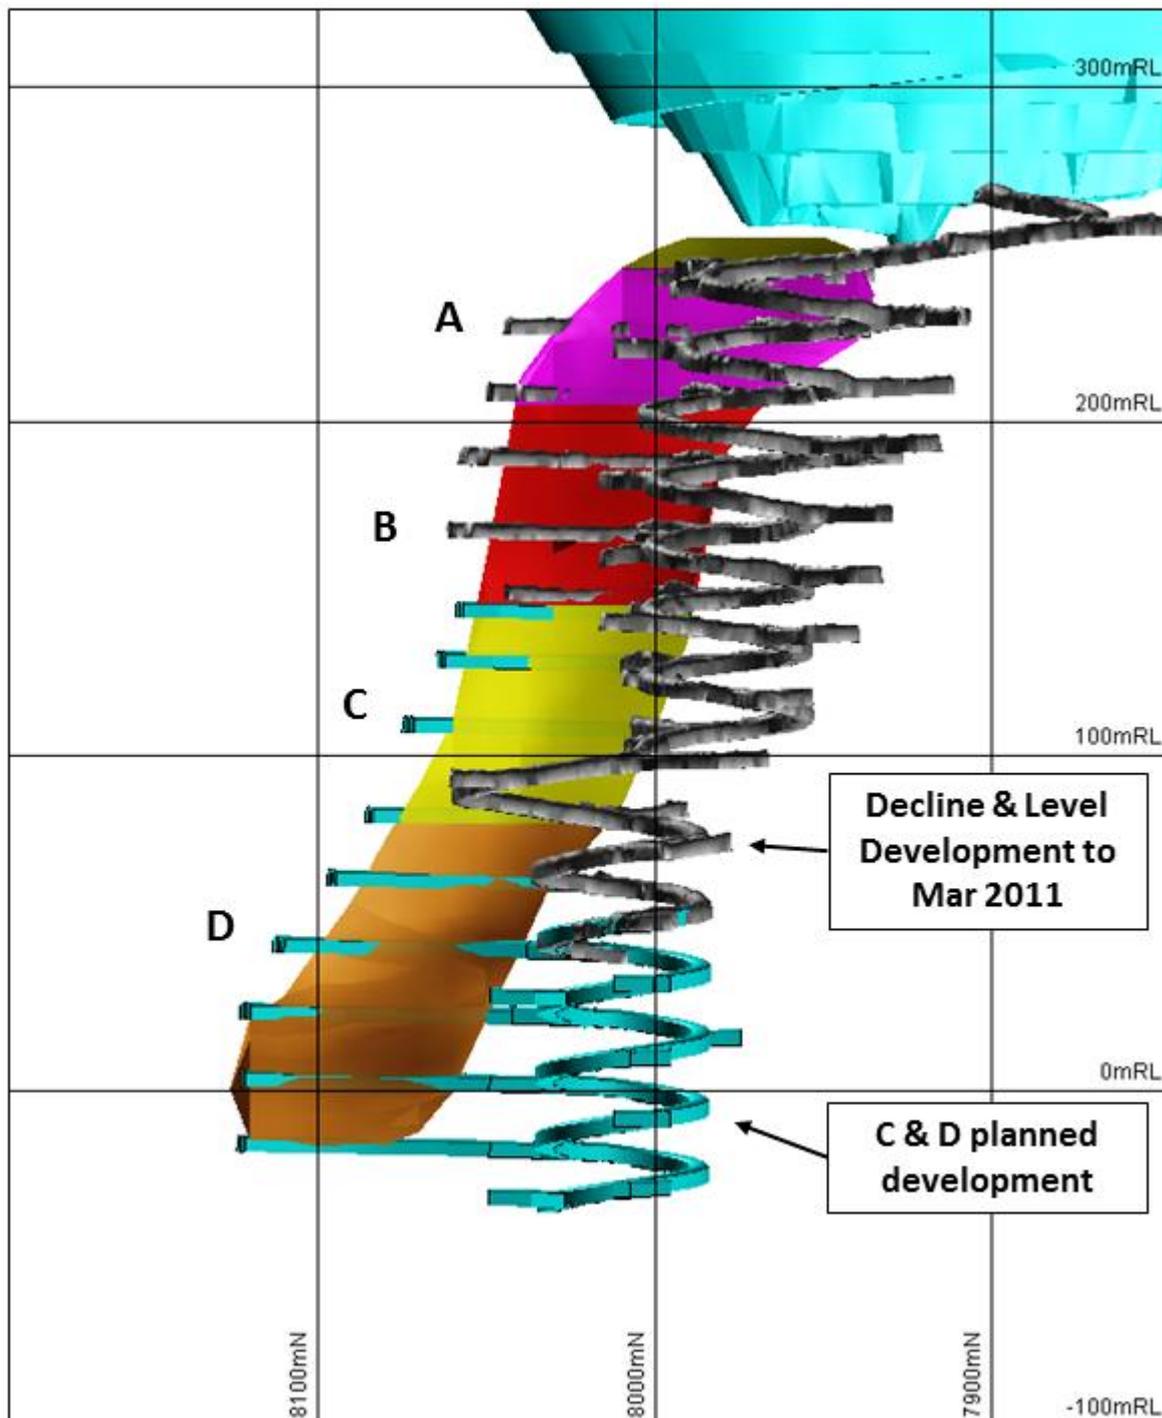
Wattle Dam mine showing new mine plan to November 2013
